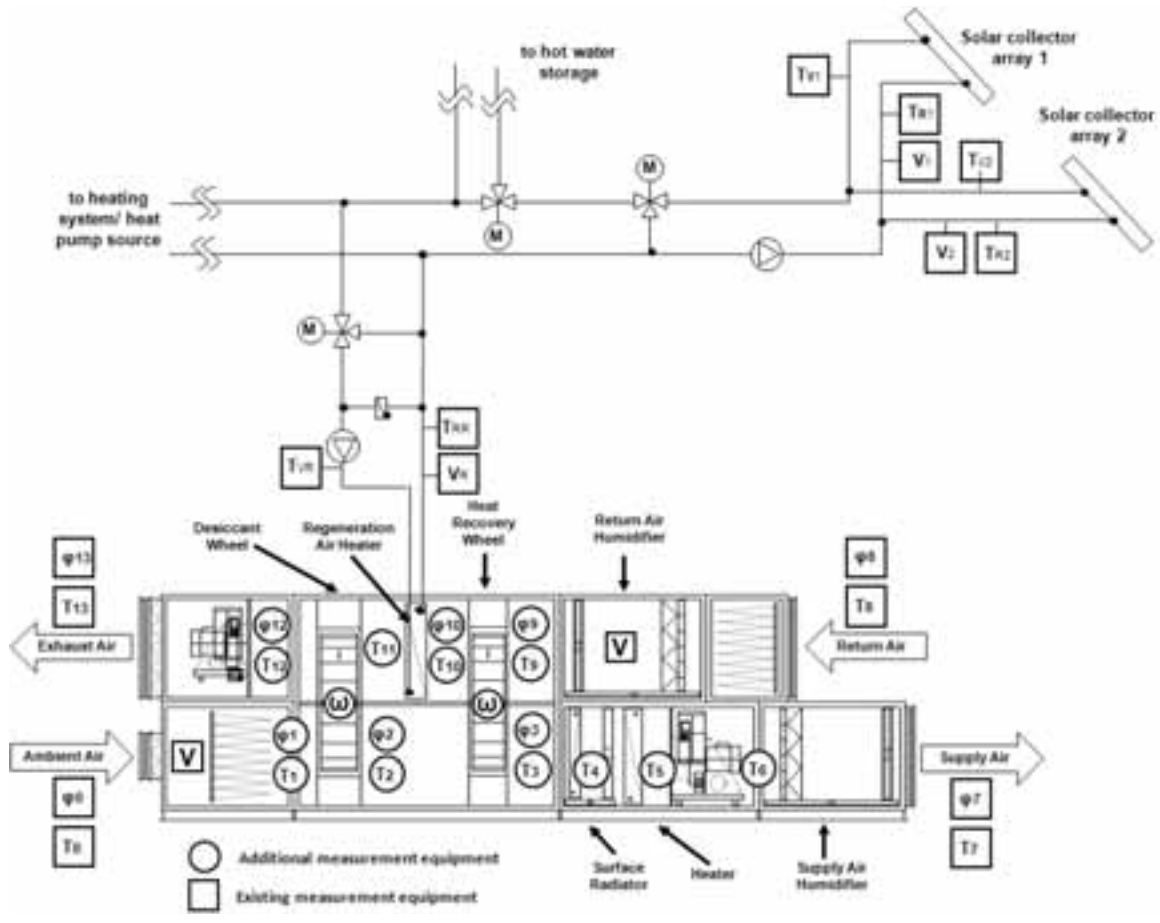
Solar DEC-system layout with existing and additional measurement equipment
